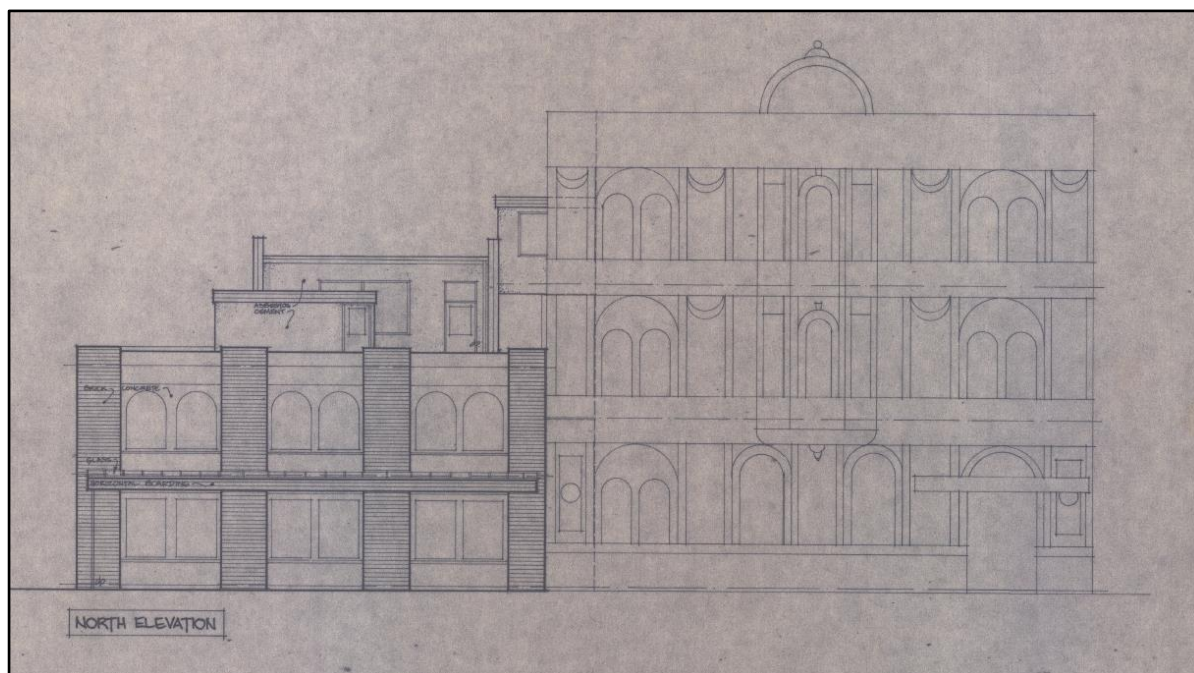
Detail from 1981 plan of *Southland Times* Building, showing the addition of new offices to the east of the original building (Simpson, 1981).
